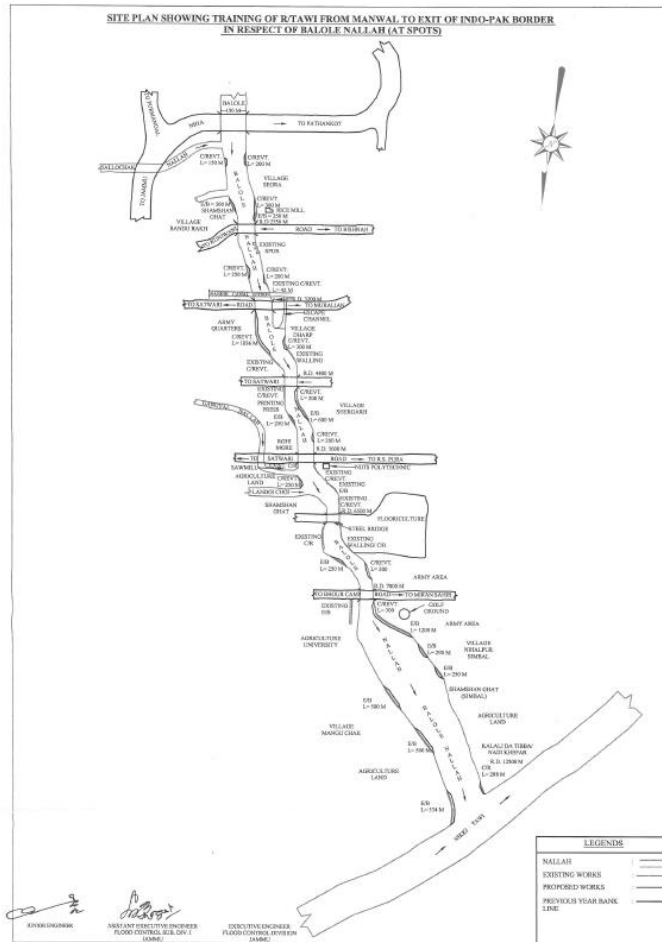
Site Plan of existing and proposed works in Balole Nallah.
